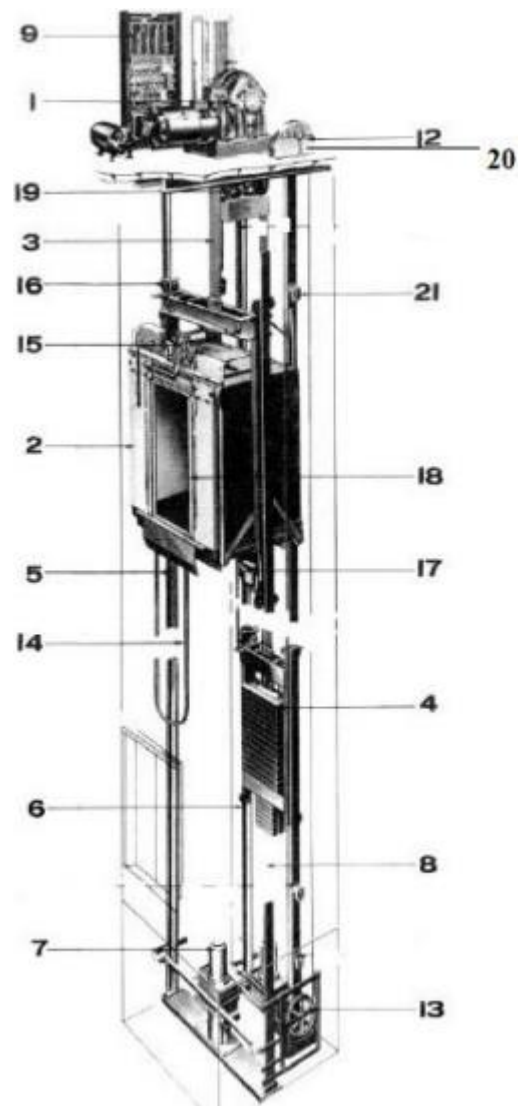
Typical passenger lift: 1 - winch, 2 - cabin, 3 - suspension cables, 4 - counterweight, 5 - cab guides, 6 - counterweight guides, 7 - buffer cabin, 8 - counterweight buffer, 9 - control cabinet, 12 Speed limiter, 13 - Speed limiter tensioner, 14 - Suspension cable, 15 - Door drive, 16 - Shoes, 17 - Cabin catcher, 18 - Door safety device, 19 - Outlet unit, 20 - Safety limit switch.
